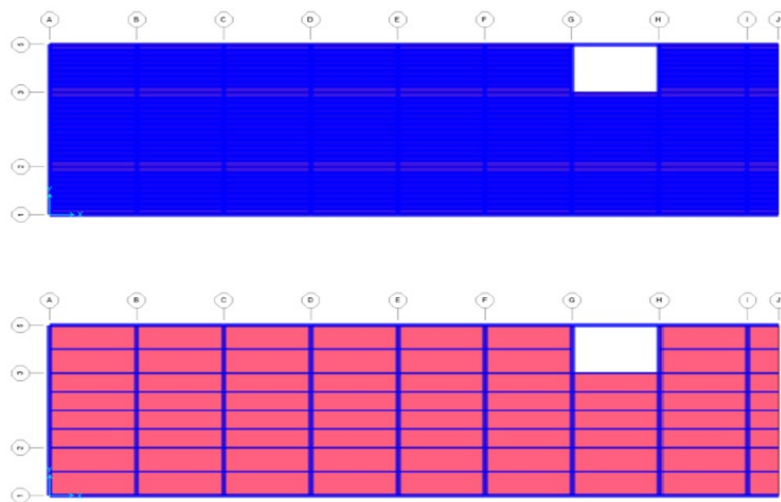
Alternative mass timber structural redesign – floor slabs
